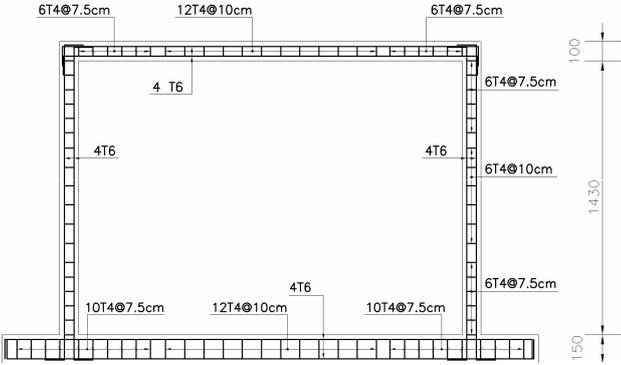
Reinforcement details of the wall specimens (dimensions in mm)
